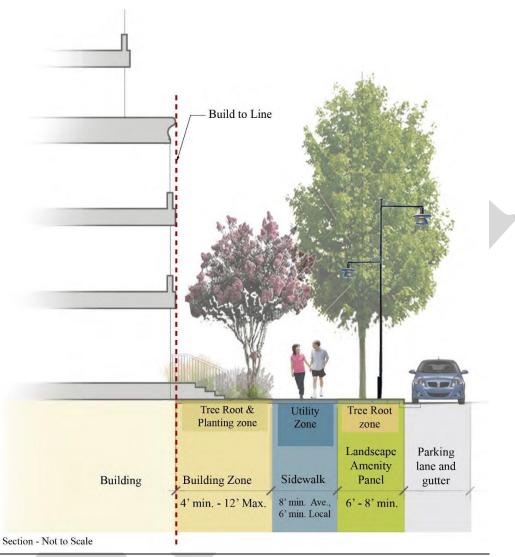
Figure X: Avenue/Collector/Local Street Streetscape with Residential Building, Section
